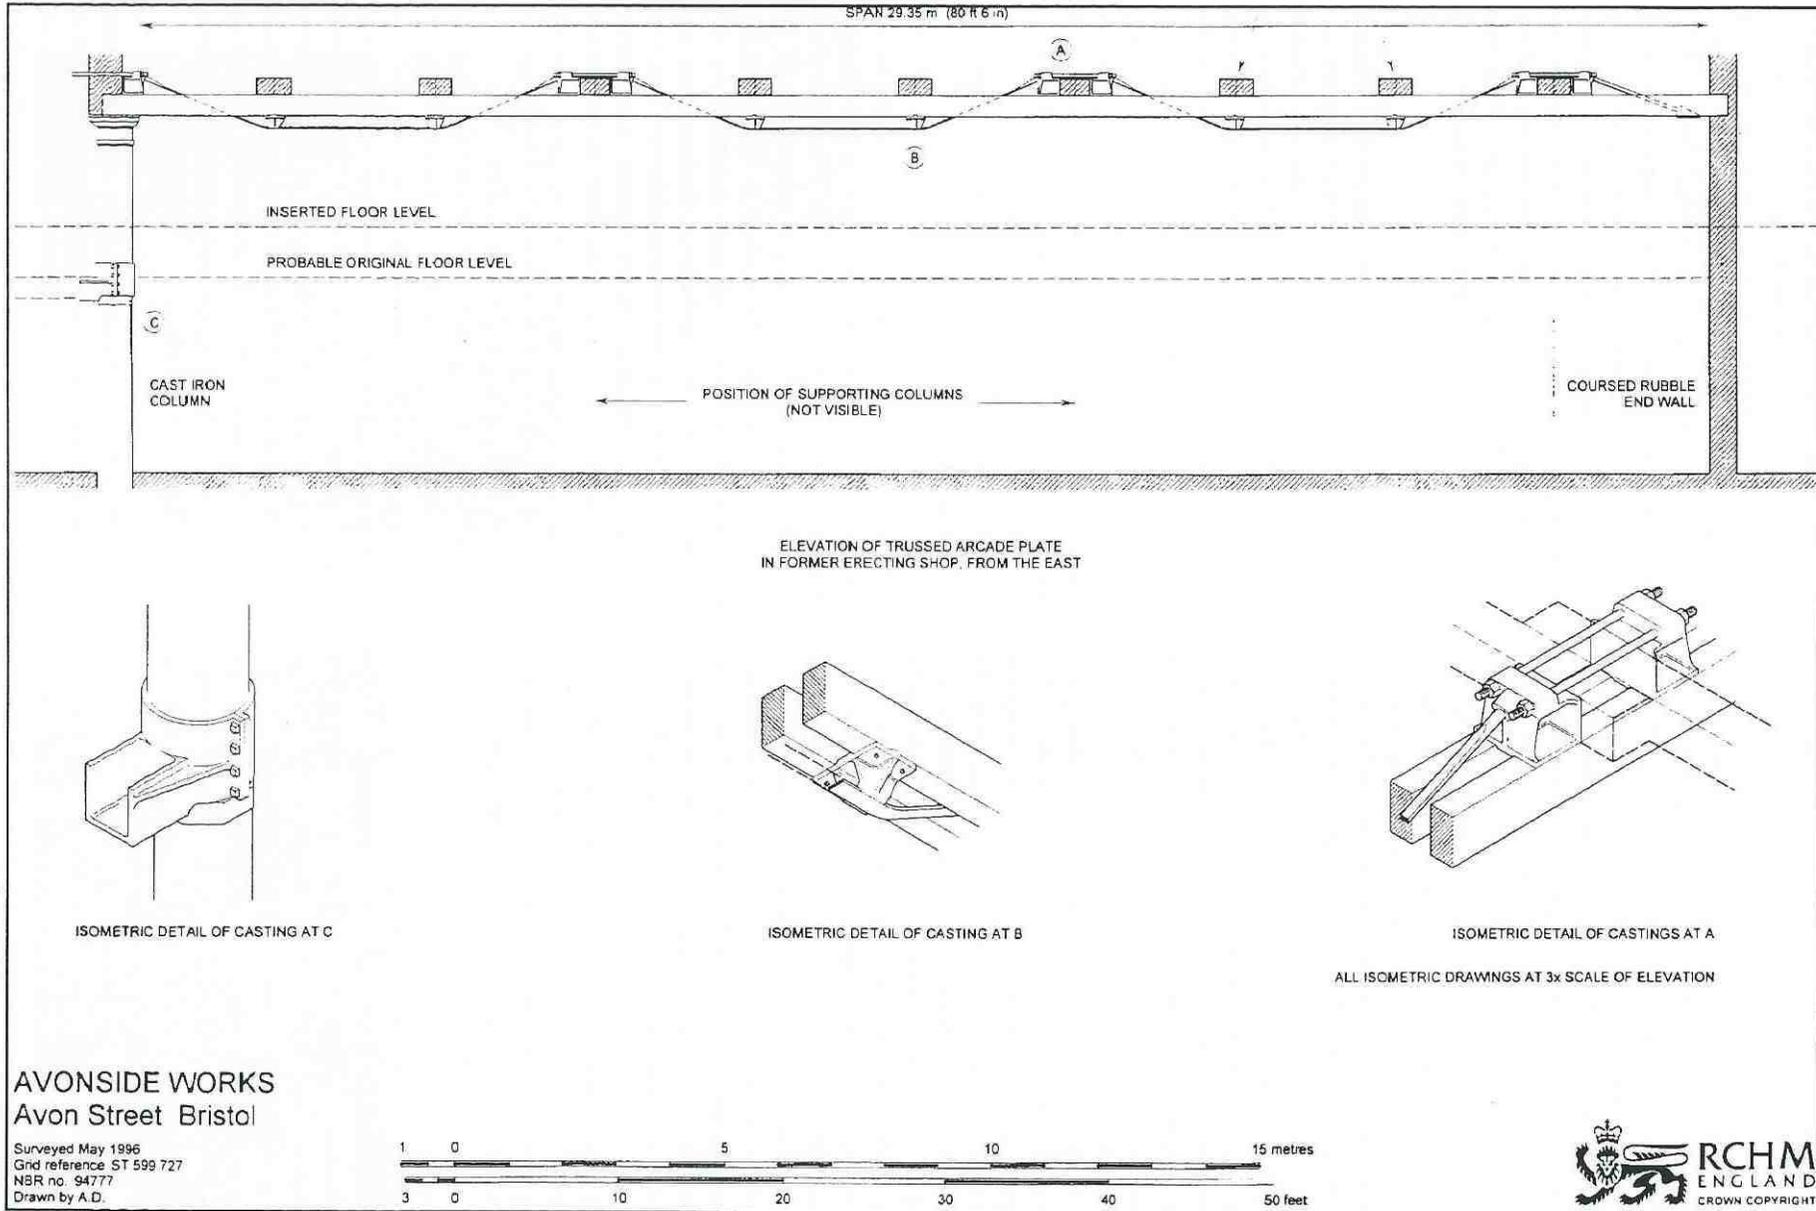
Elevation of the trussed arcade plate in the former erecting shop, from the east, and isometric details
